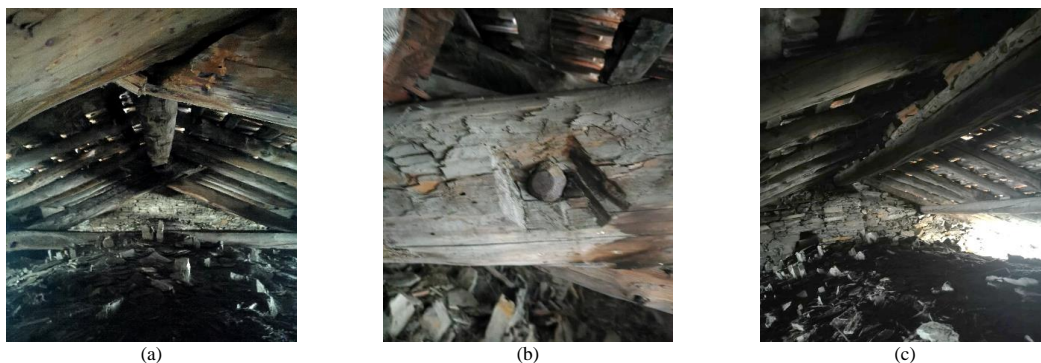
(a) Existing wooden roof structure; (b) existing metal pin between timber struts and ties; (c) ridge beam undergoing excessive deflection.
